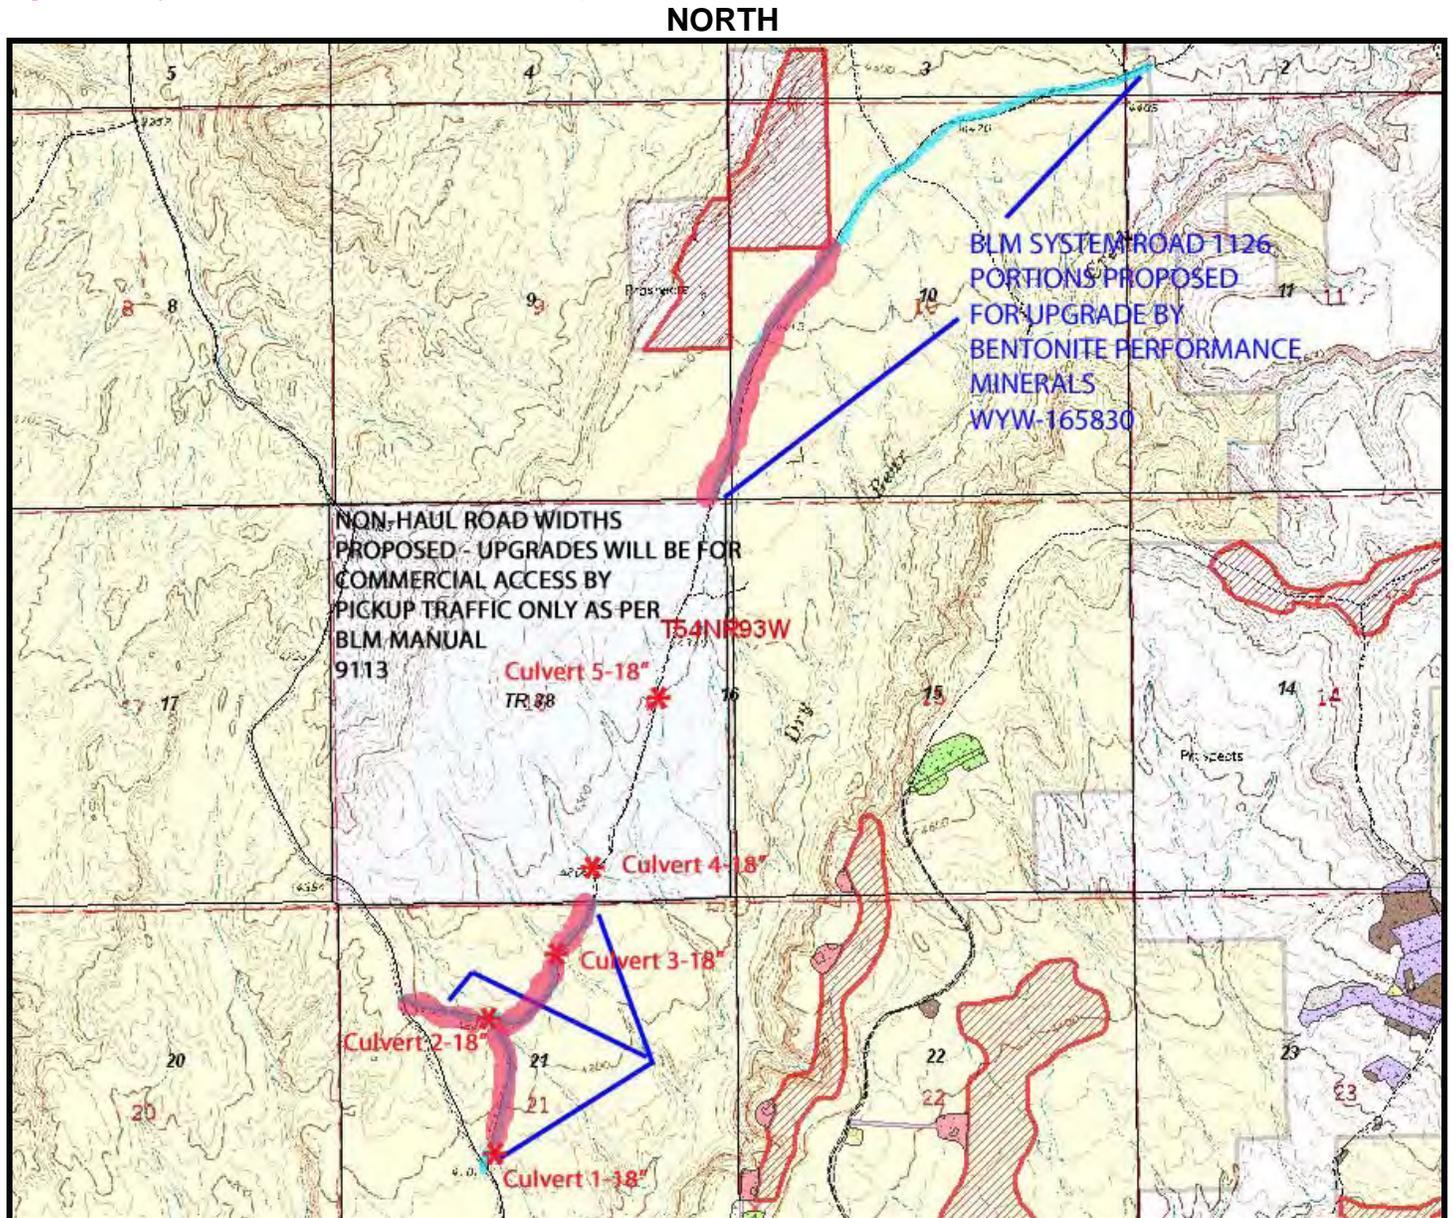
Location of Dry Bear Road (BLM System Road 1126) proposed upgrades for commercial pick-up truck traffic/access to the A-5 and “2008 update” areas – Plan of operations modification- Sections 9, 10, and 21, T. 54 N., R. 93 W.; Proposed Lower Seven claims area on patented land is again illustrated in Sections 3, 9 and 10 above (red hatched area).
